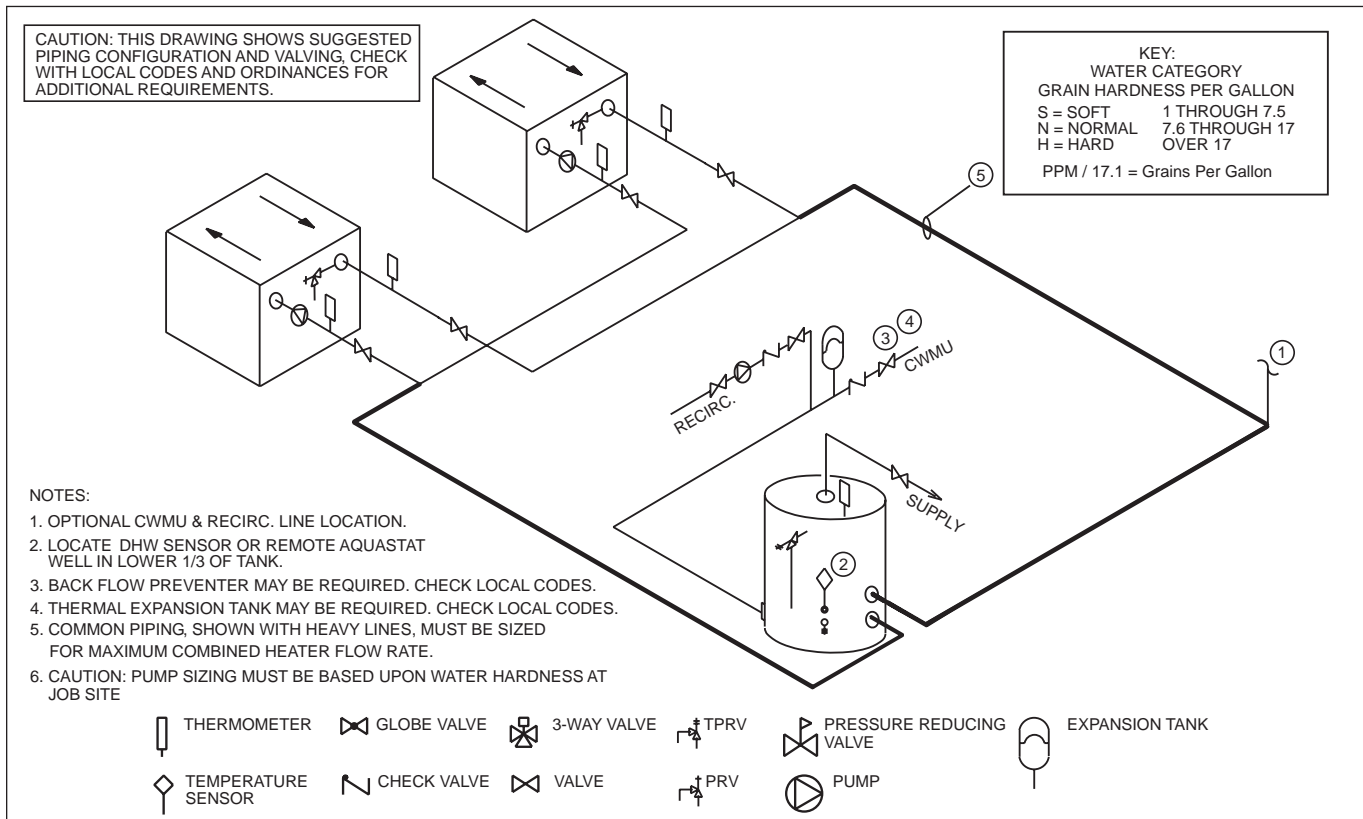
Water Heater Piping — Multiple Heaters, One Tank.
